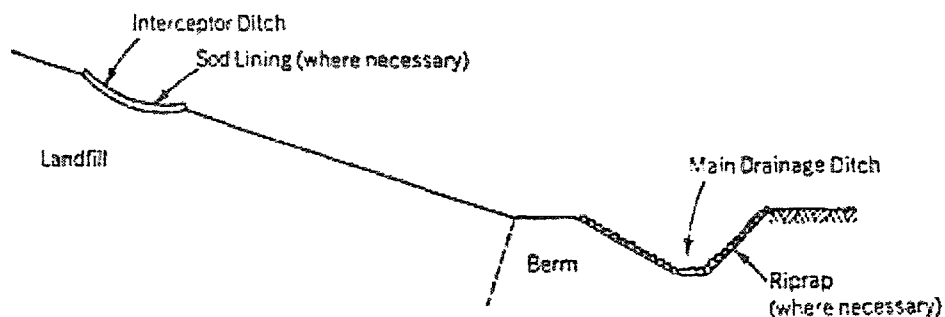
Typical arrangements in landfills for surface water routing (Bagchi, 1989)
